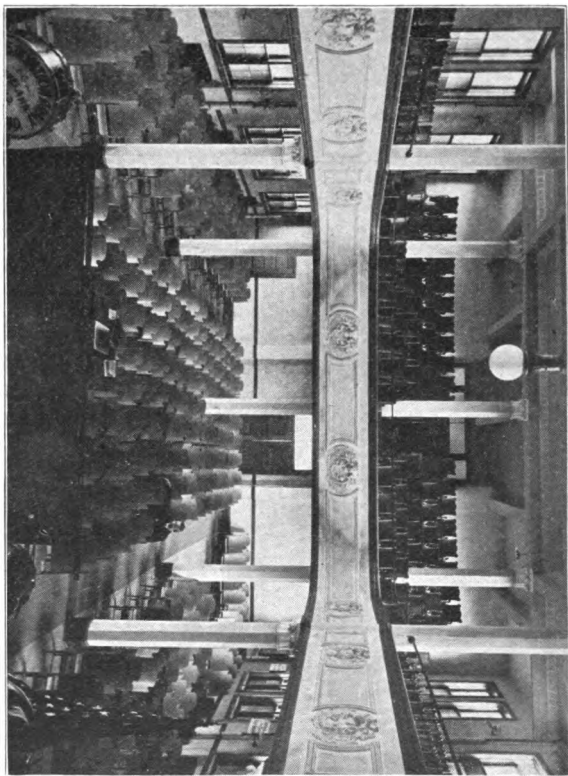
Octagonal Columns, Auditorium, Salvation Army Building, Cleveland, O.
